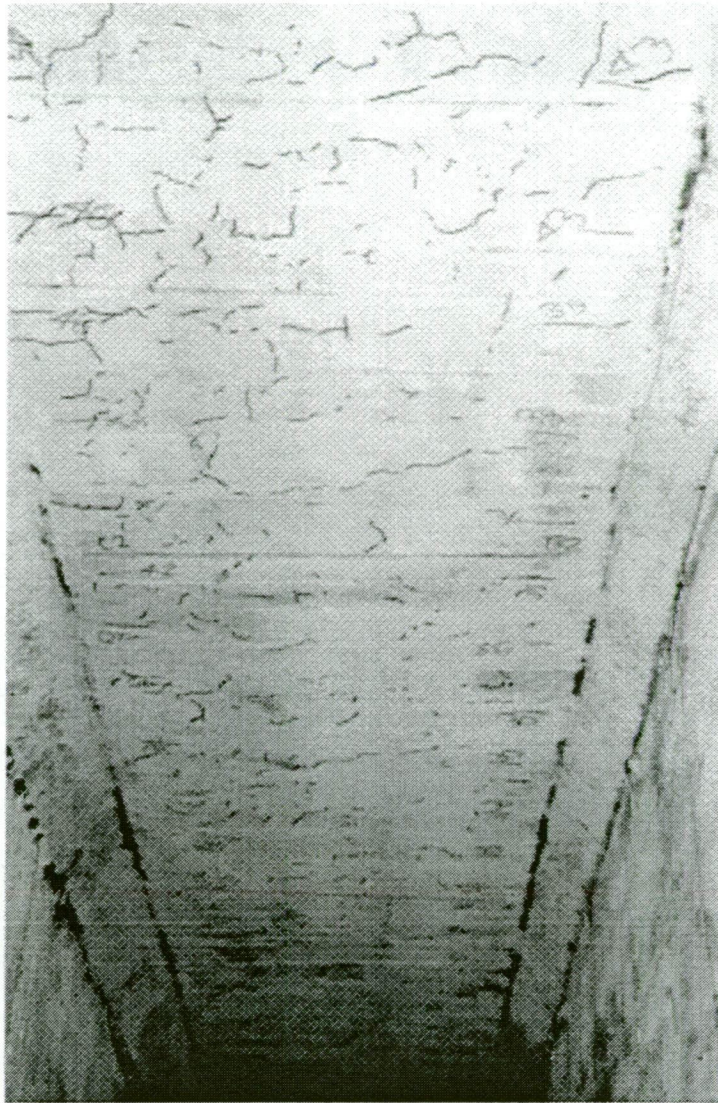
Pre-existing Deck Soffit Cracking
